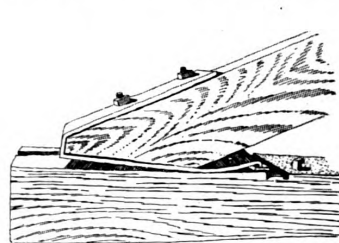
Showing Failure of Joint Similar to Fig. 6.
